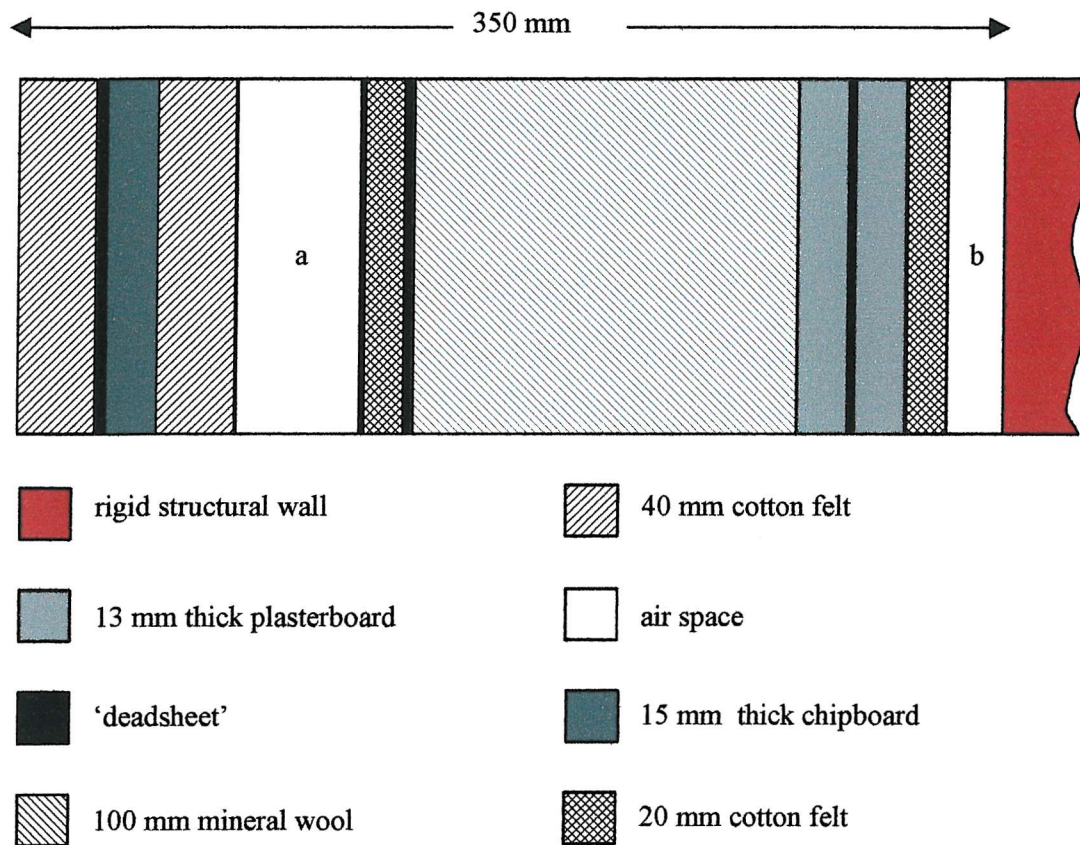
Cross section of the Tio Pete multi-layer wall model
